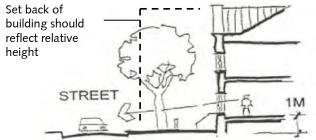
Elevated ground floors enhance visual contact and reduce need for a high wall adjacent the carriageway
